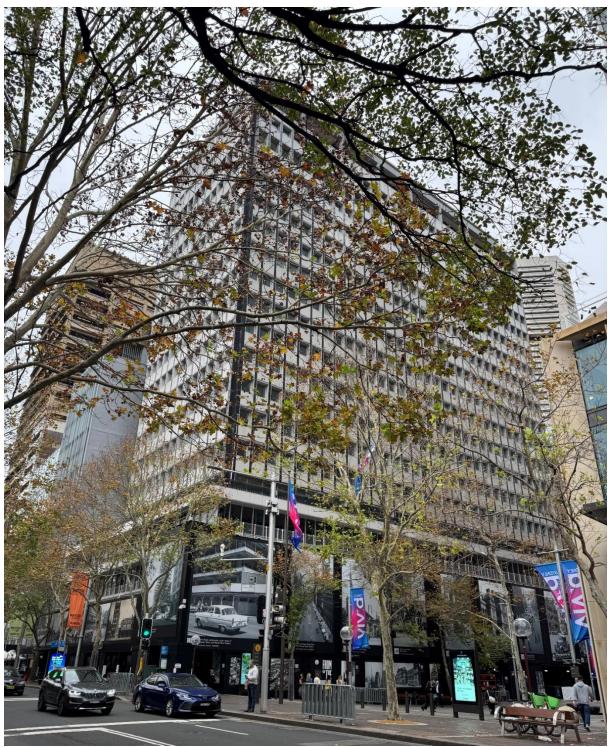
Site viewed from the corner of Maritn Place and Macquarie Street
